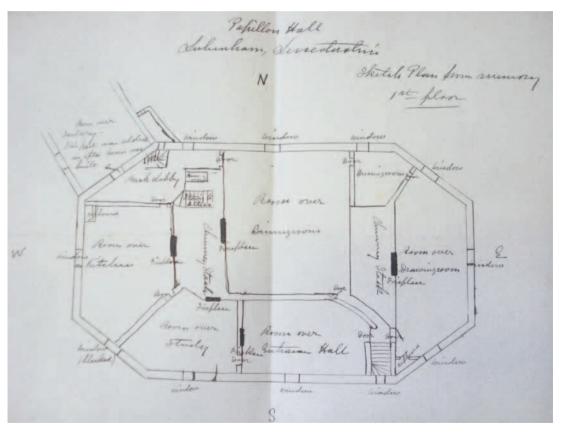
Papillon Hall first floor plan. (Leicestershire County Record Office, DE2221/23)
